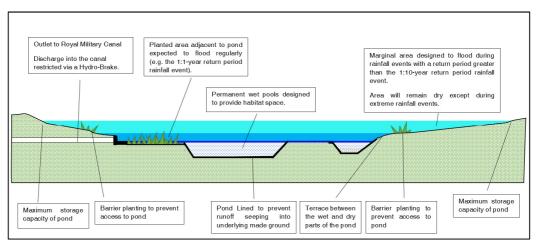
Indicative sketch showing the profile of pond (outline design only).
